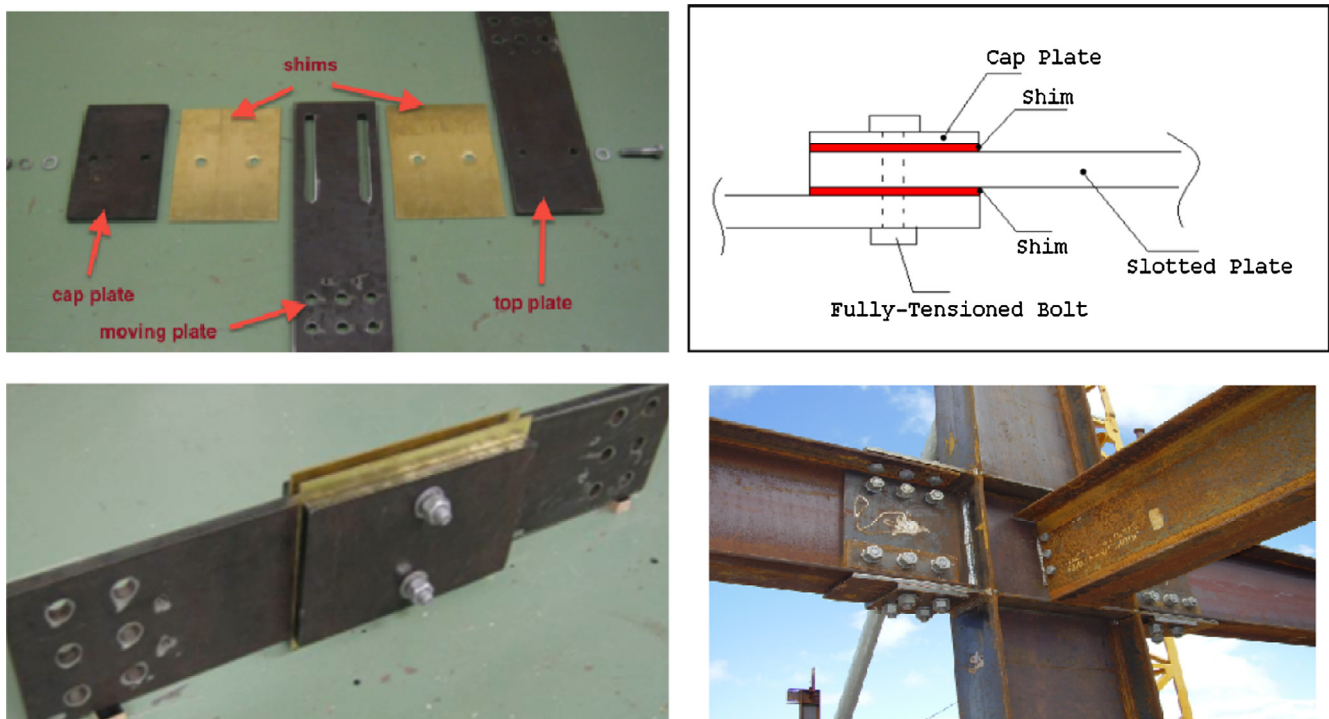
Sliding Hinge Joint mechanism; disassembled device (top left), two assembled views (top right and bottom left) and column/beam connection using the design approach (bottom right) [5].
